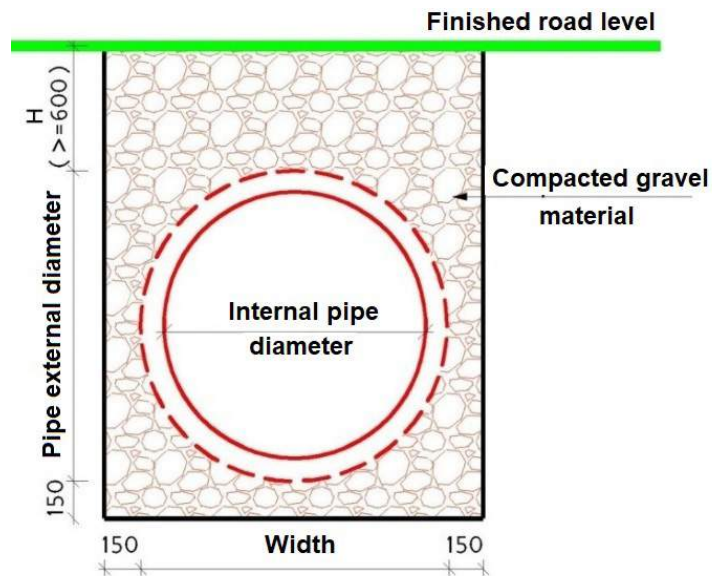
Typical section of pipe culvert with gravel bedding
